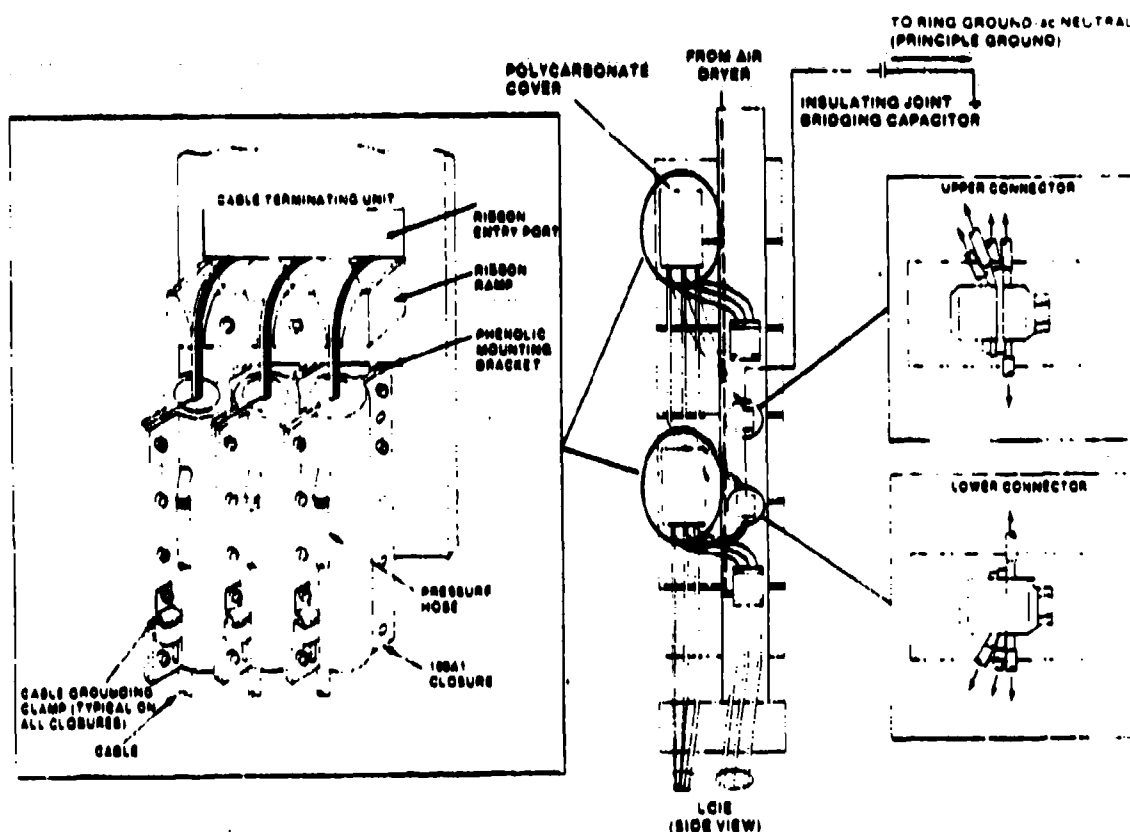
Detail Views of Cable Terminations on Lightguide Cable Interconnection Equipment.
